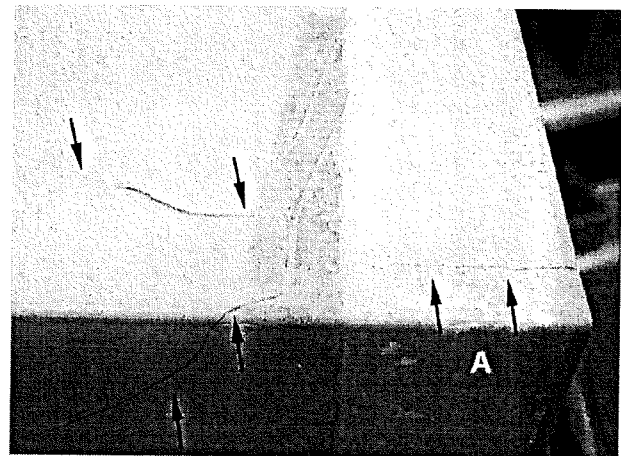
Crack starting at an element corner and branching after about 50 mm.
